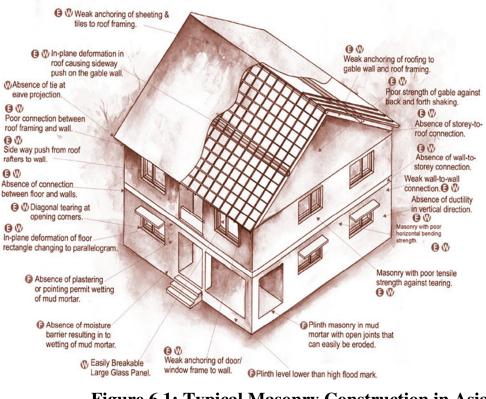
Typical Masonry Construction in Asia © UNDP (2008) ®
